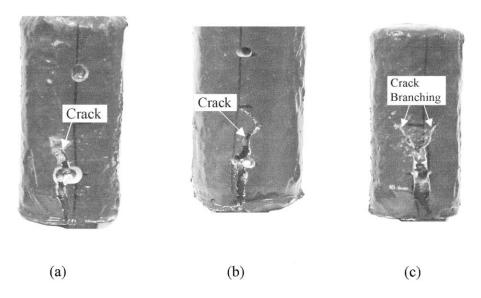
Coated concrete cylinders after 3 years in 3% sulfuric acid: (a) cracking in a 12.5-mm holiday, (b) cracking in a 6-mm holiday and (c) crack branching.
